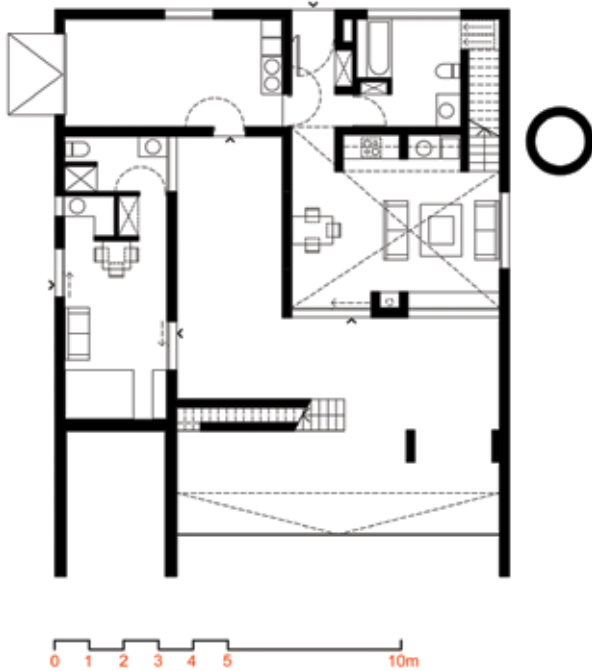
The *One Megabyte House*. Ground Floor Plan. On the bottom right of the plan, the long 'Miesian' wall extends southward into the nine metre high 'wall' of the existing dune. Drawing by Alexander Oppen, 2005.
